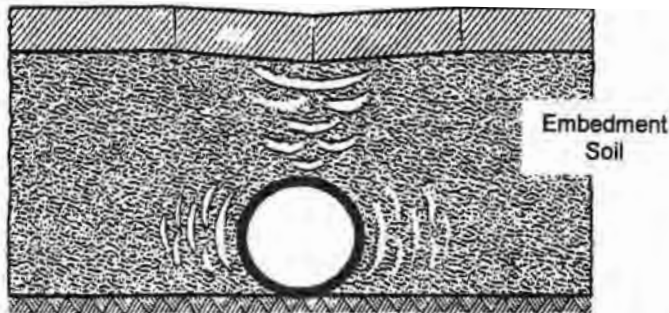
Pavement Failure Due to Inadequate Embedment Soil Compaction or Low-Quality Embedment Soil Adjacent to Flexible Pipe
